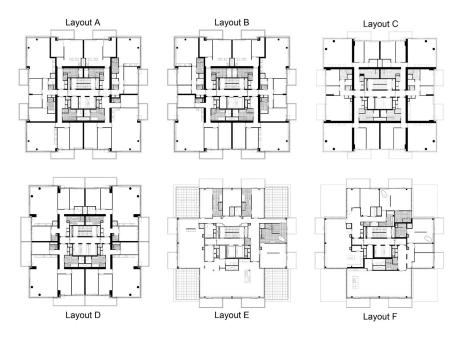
Tower's floor plan layouts. Source: V8 Architects
